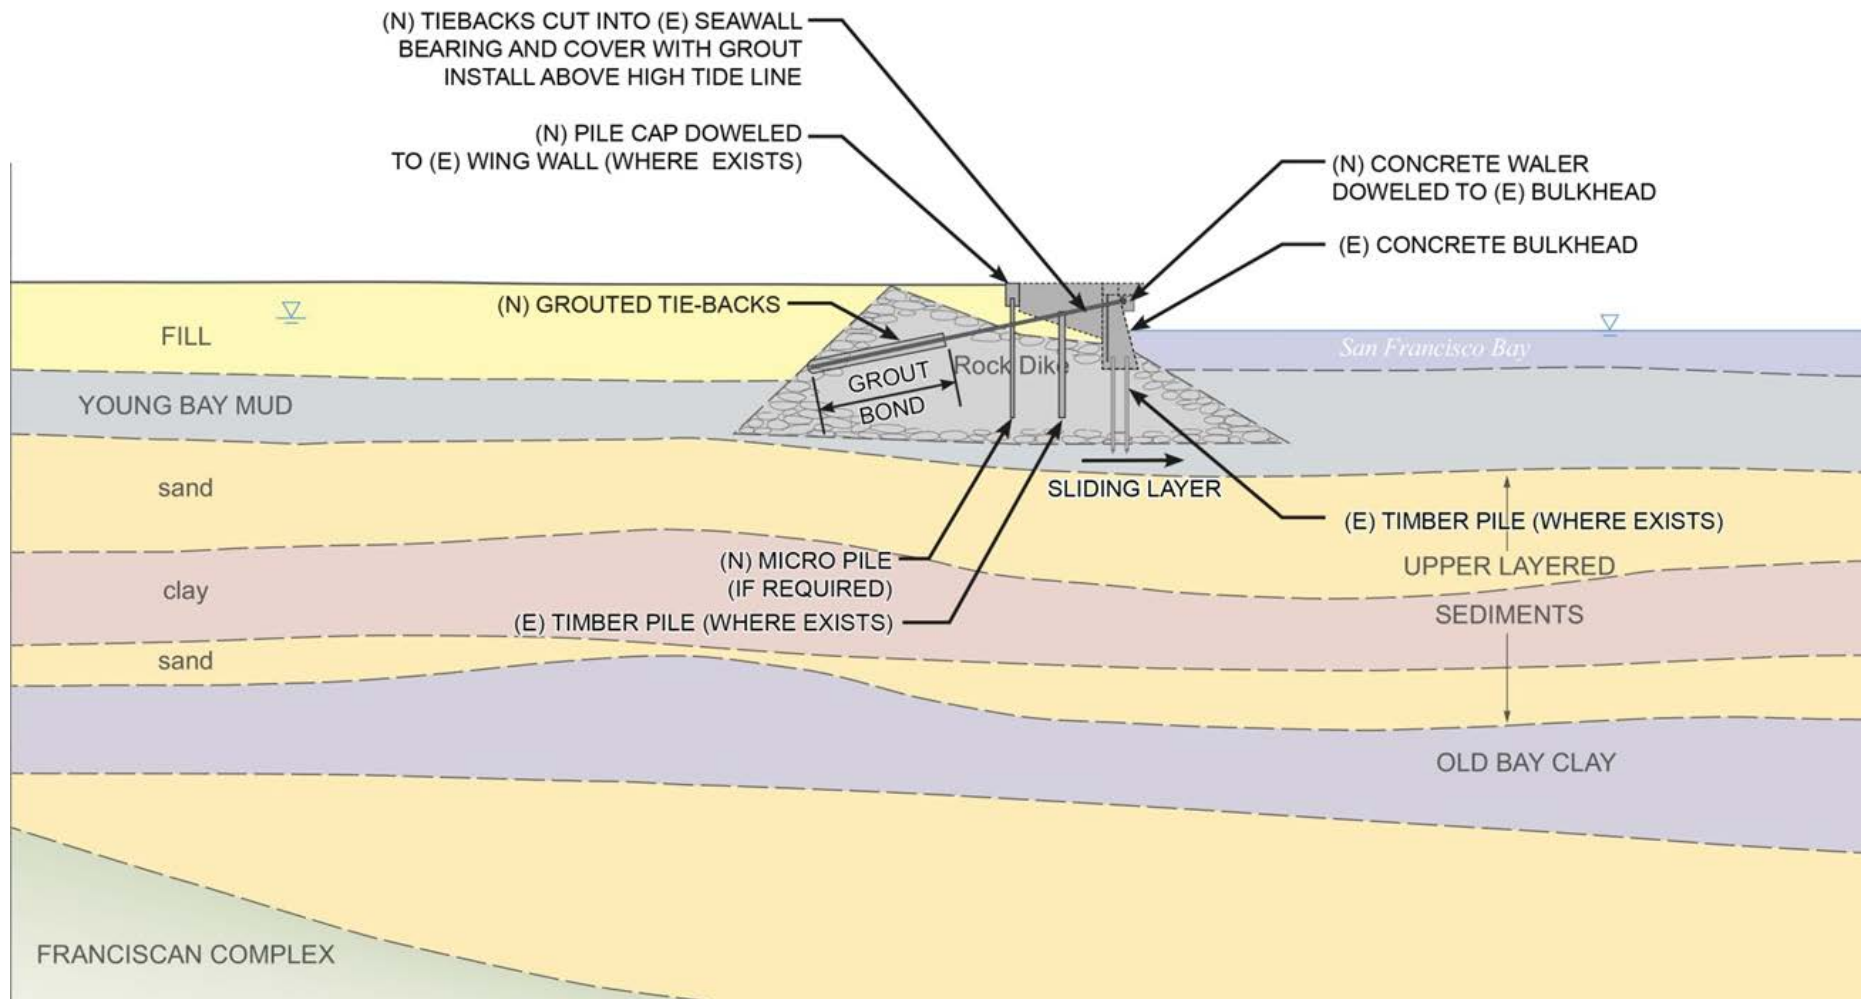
Bulkhead Wall Retrofit - Tiebacks and Micropiles
